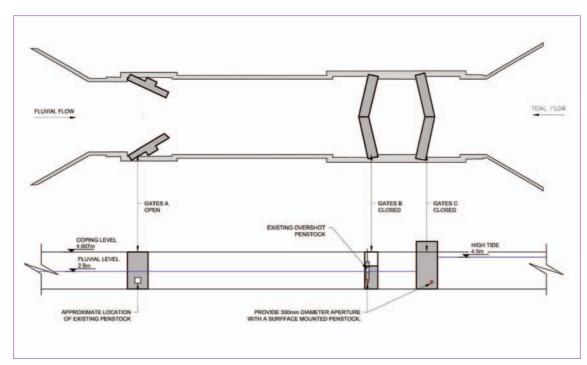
Fulney Lock in plan and elevation showing position of penstocks
